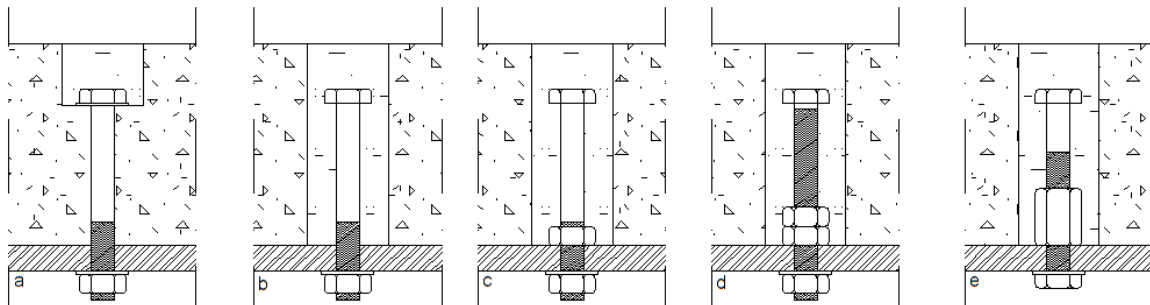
Demountable shear connectors: a) Friction grip bolt; b) Embedded bolt; c) Embedded bolt, single nut; d) Embedded bolt, double nut; e) Embedded bolt with coupler
